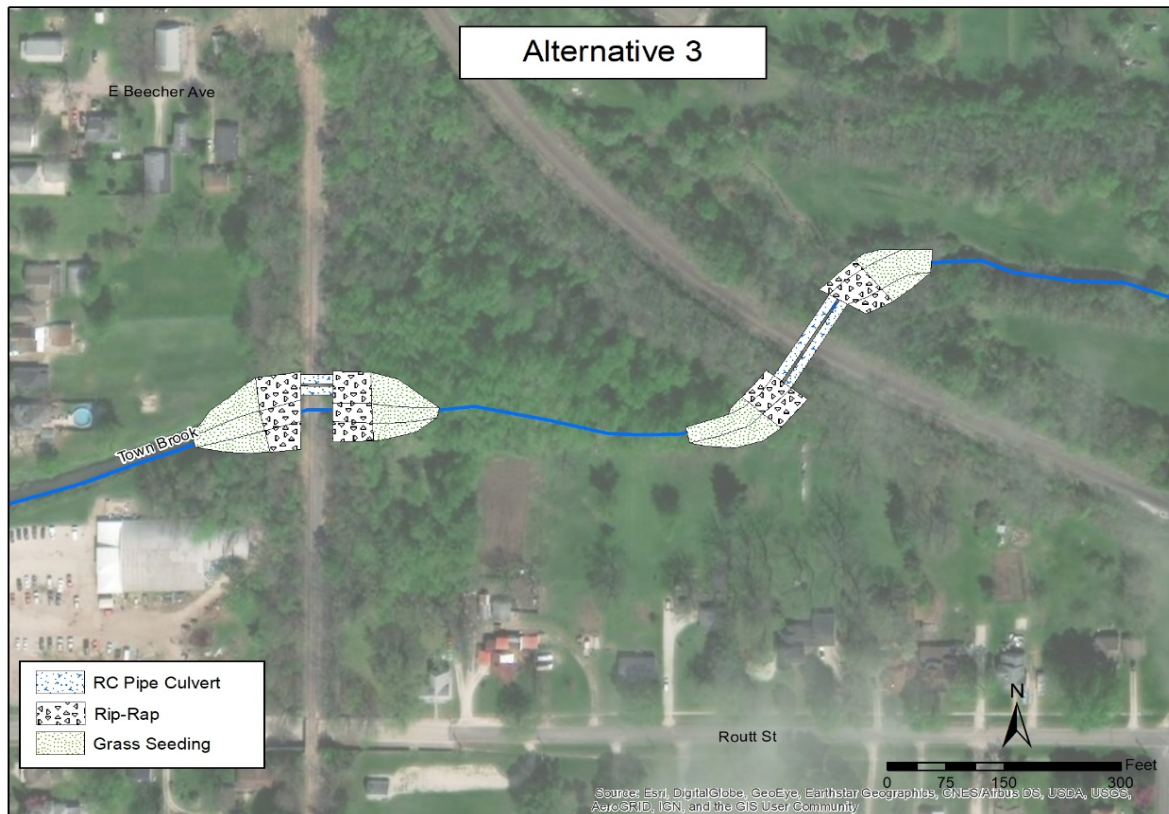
Alternative 3 – Plan View of New Upstream and Downstream Culverts
